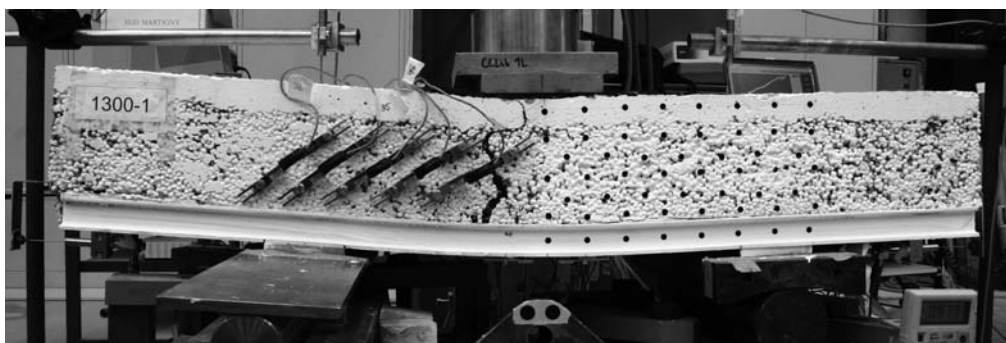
1300s-1: Failure process on west side (north left, south right).
